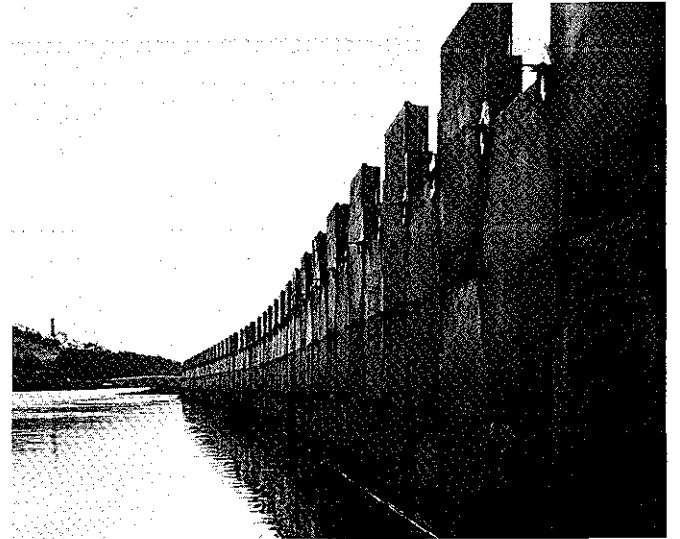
Reinforced Earth wall in Fremersdorf, high water during stage of construction
